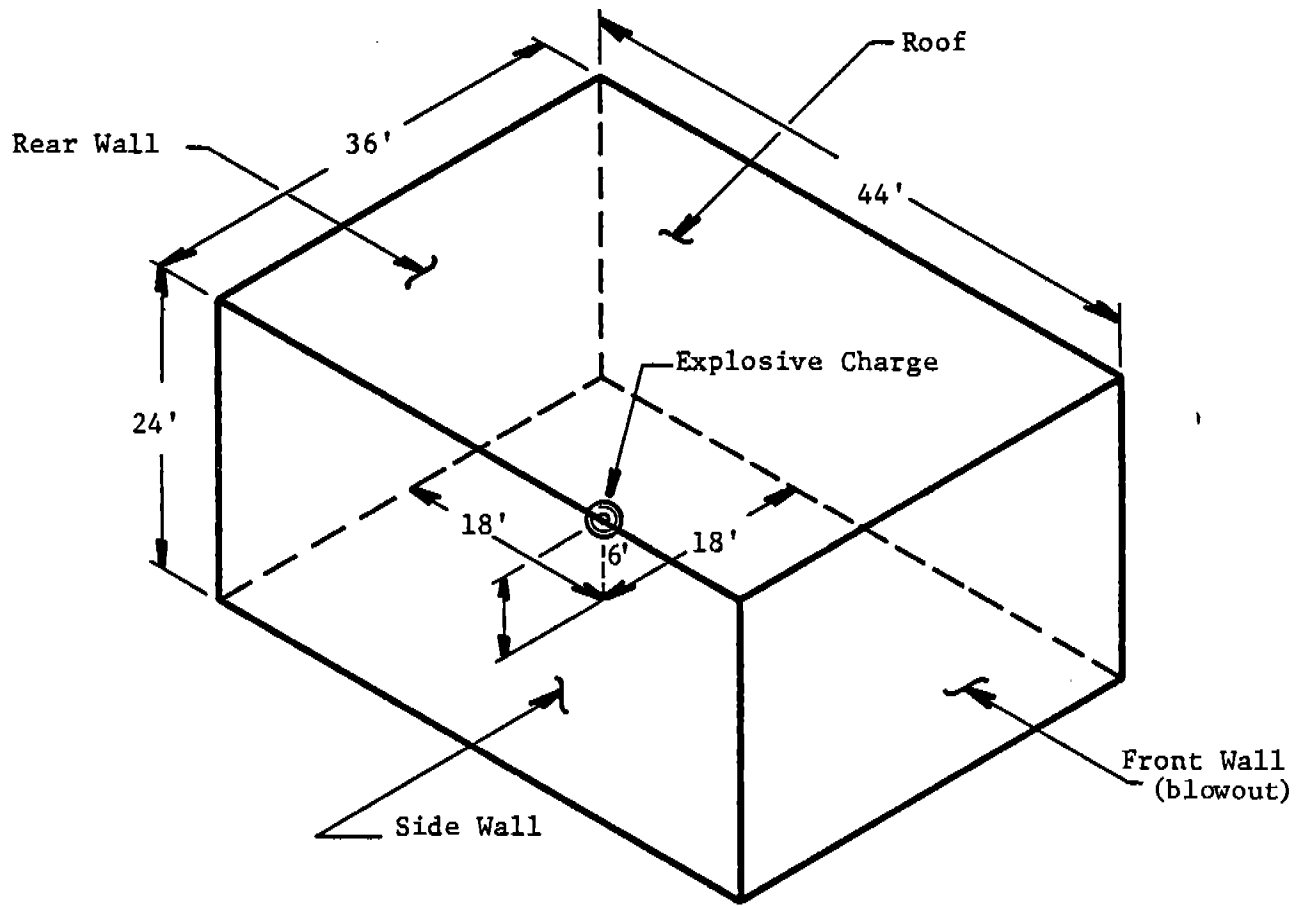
Sketch Of Room Loaded By Internal Blast
